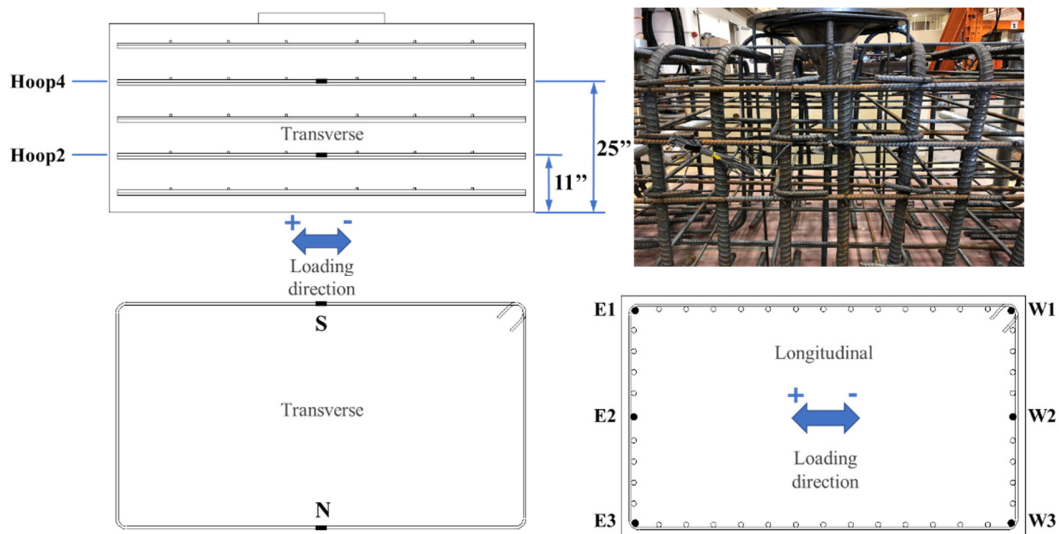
Strain gauges layout of the bottom block's longitudinal and transverse reinforcement.
